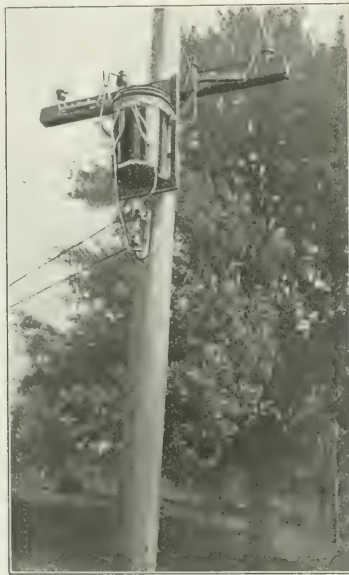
RURAL TRANSFORMER INSTALLATION, SHOWING BROOMSTICK CUTOUTS
